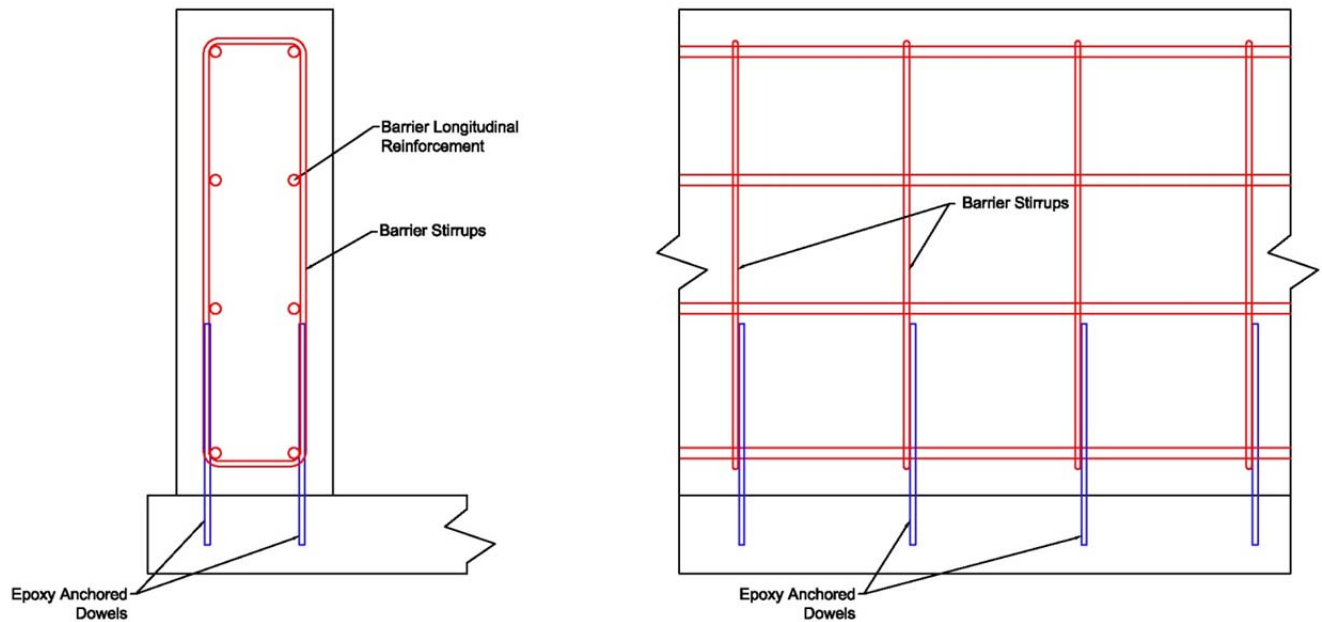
Schematic of Assumed Epoxy Adhesive Anchor Layout
